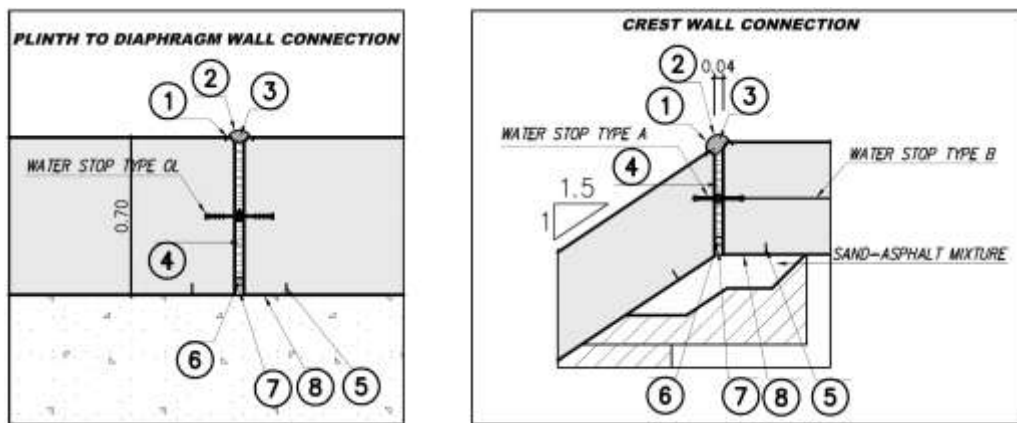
Details: a) Plinth to cut off wall connection and b) Crest wall connection (reproduced with permission of EnerjiSA).
